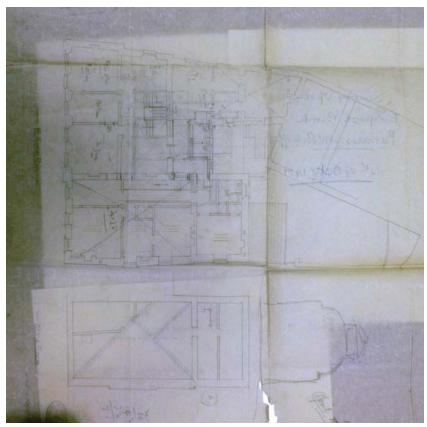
First floor and attic plan of bank and offices to be converted to council chambers, dated 1901 (CAC(B) Z/1028/2 1901-1904)
